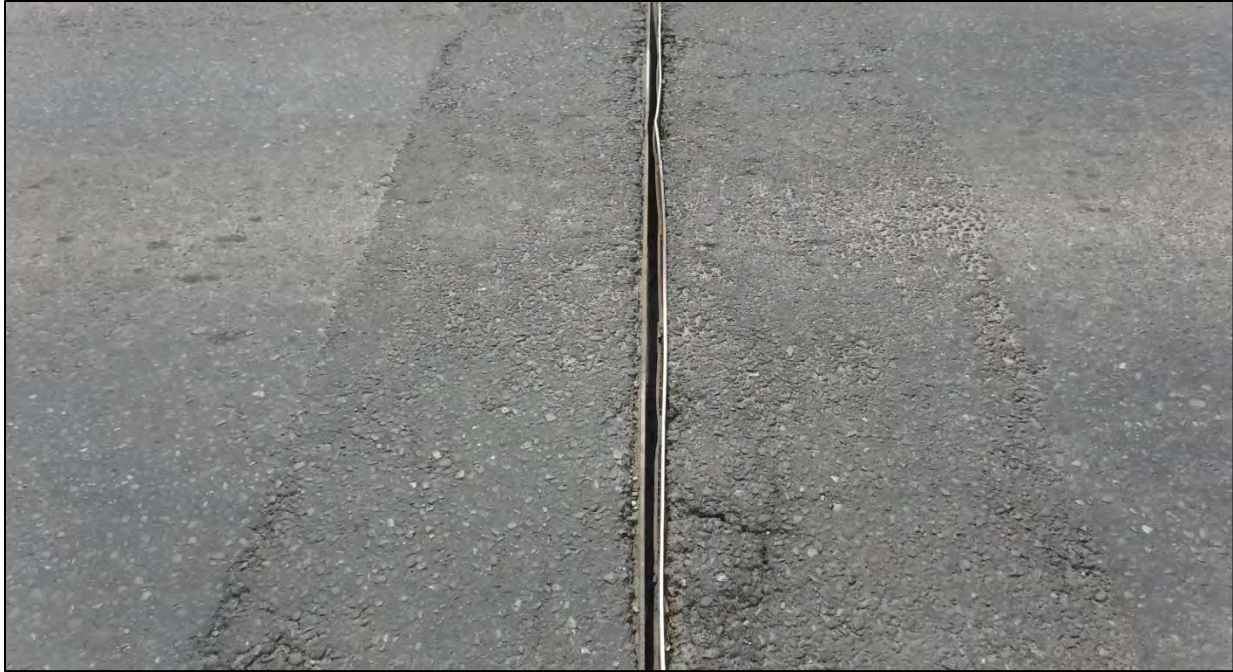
Joint 1 over Abutment 1 looking north at joint
